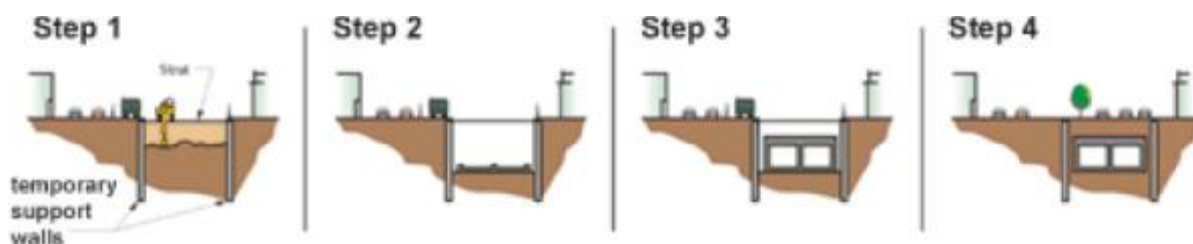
Bottom-up cut-and-cover tunnel construction steps
